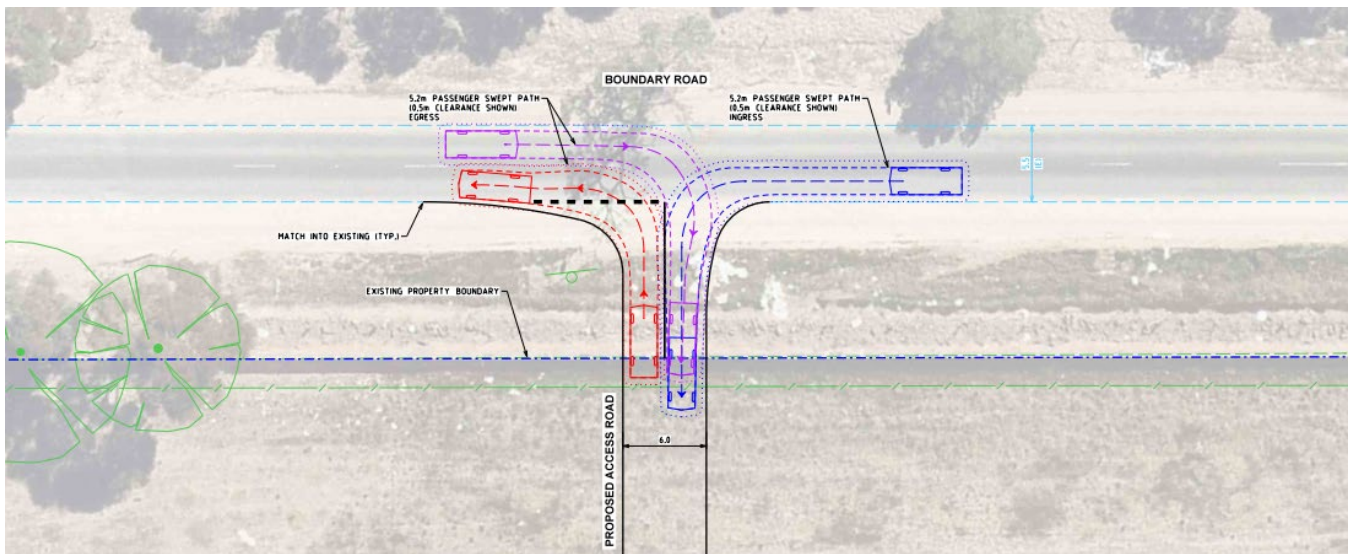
Proposed Access Concept Design (Traffic Impact Assessment prepared by Salt3, 2025)
